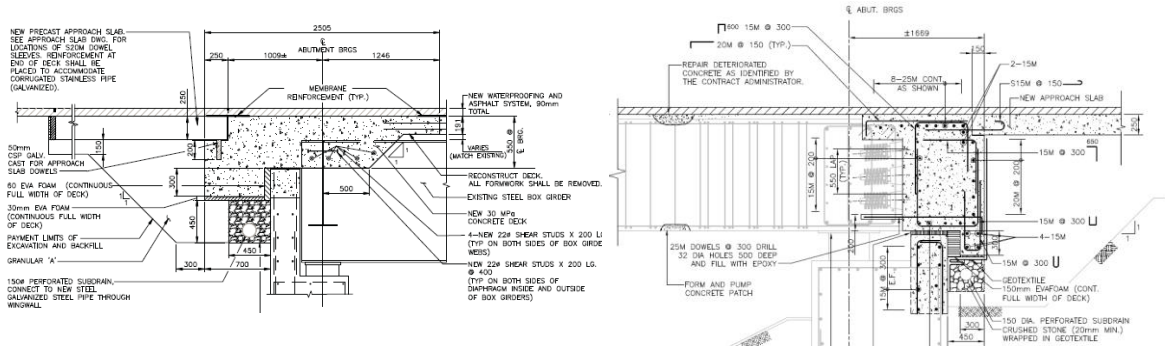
Examples of bridge rehabilitations including conversion to semi-integral girder ends
